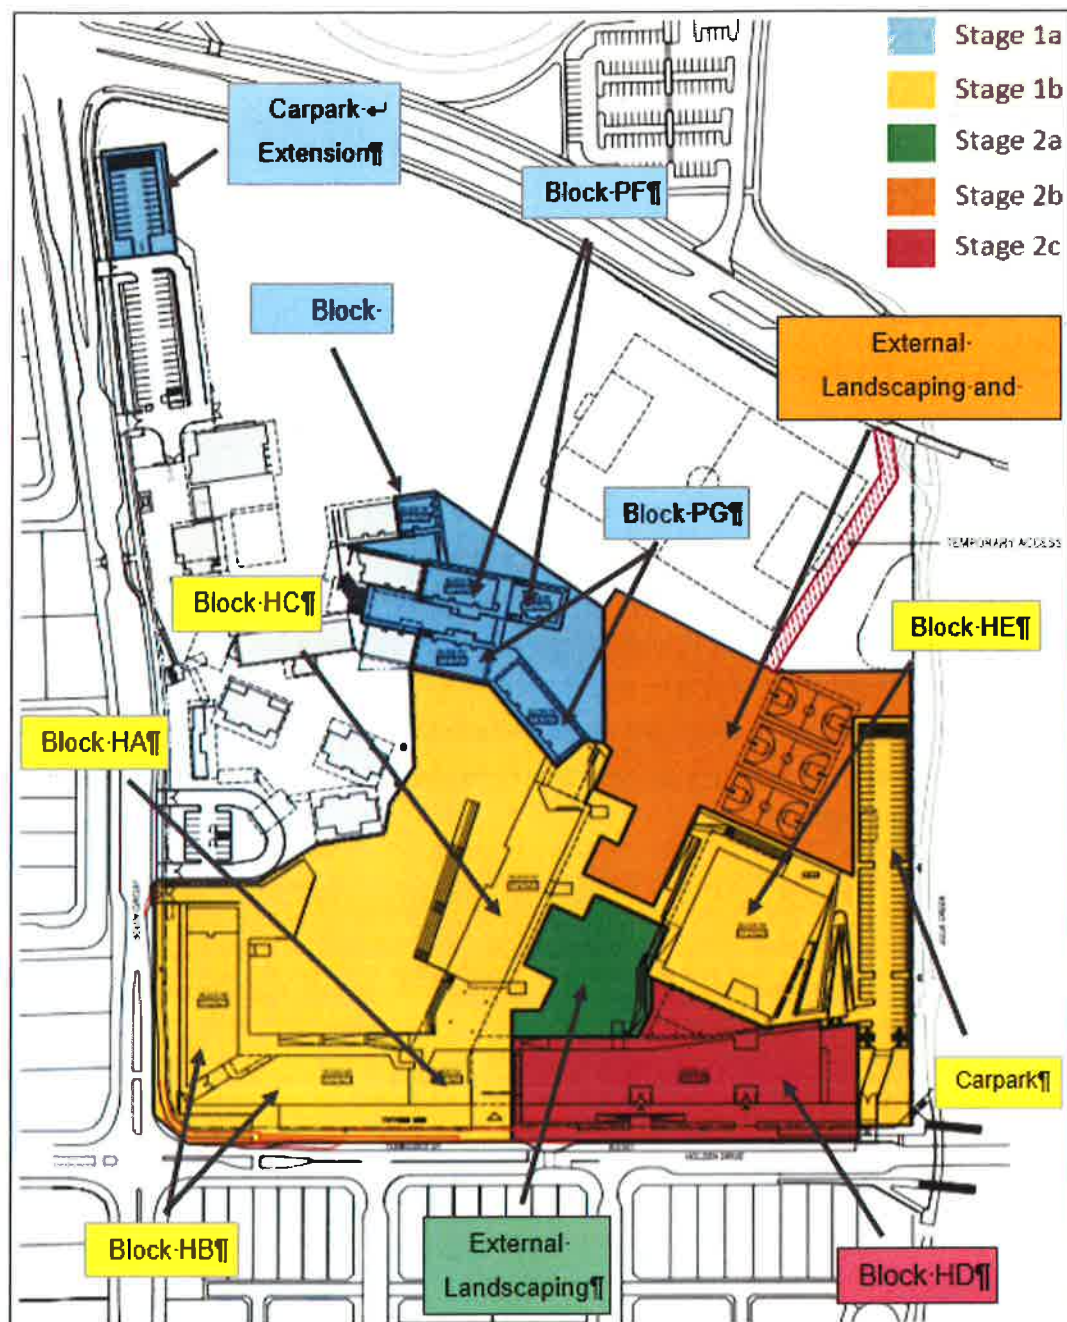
| Proposed Staging Plan (Source: Applicant's Modification Application 2019)
